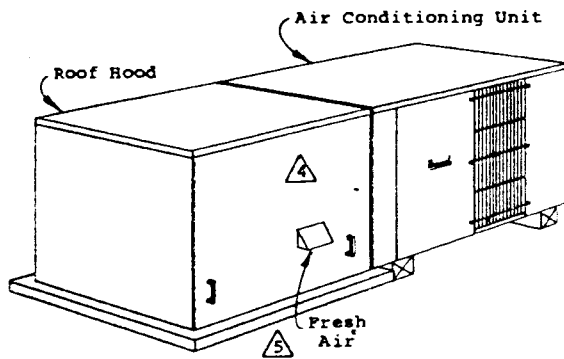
TYPICAL ROOFTOP INSTALLATION
